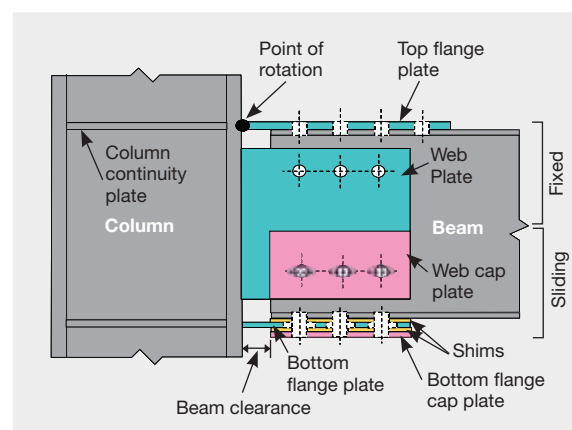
Sliding hinge joint detailing (source: Buchanan report)
